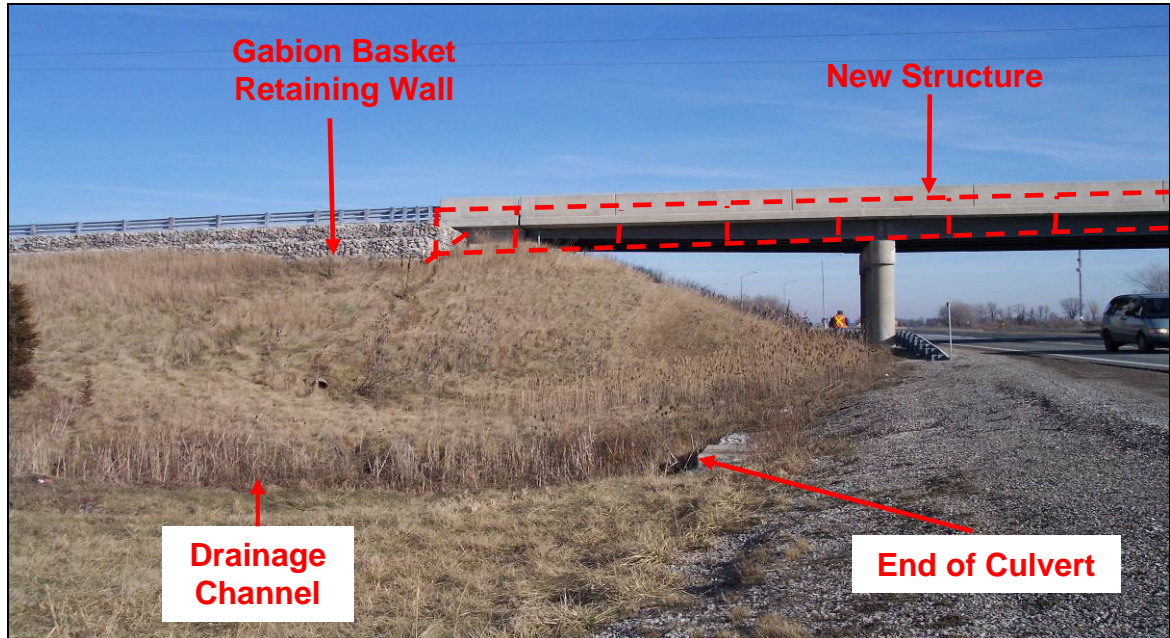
to 4-8	–	Kent Bridge Road I/C
